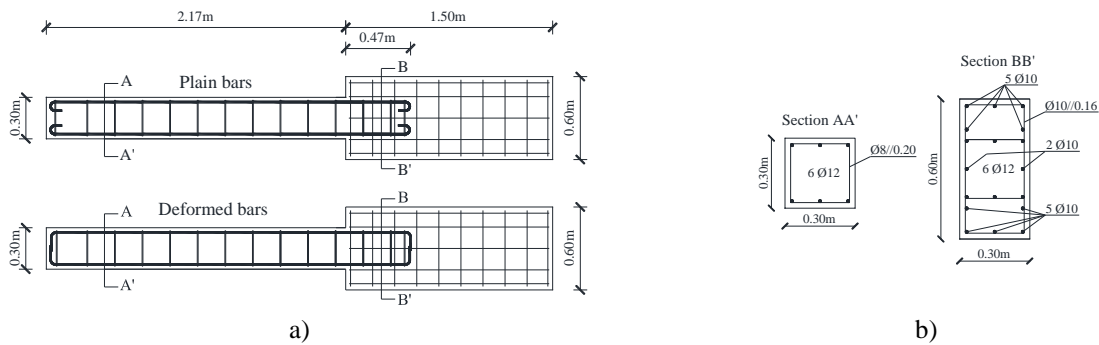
Column specimens: a) dimensions and reinforcement detailing; b) cross-sections.
